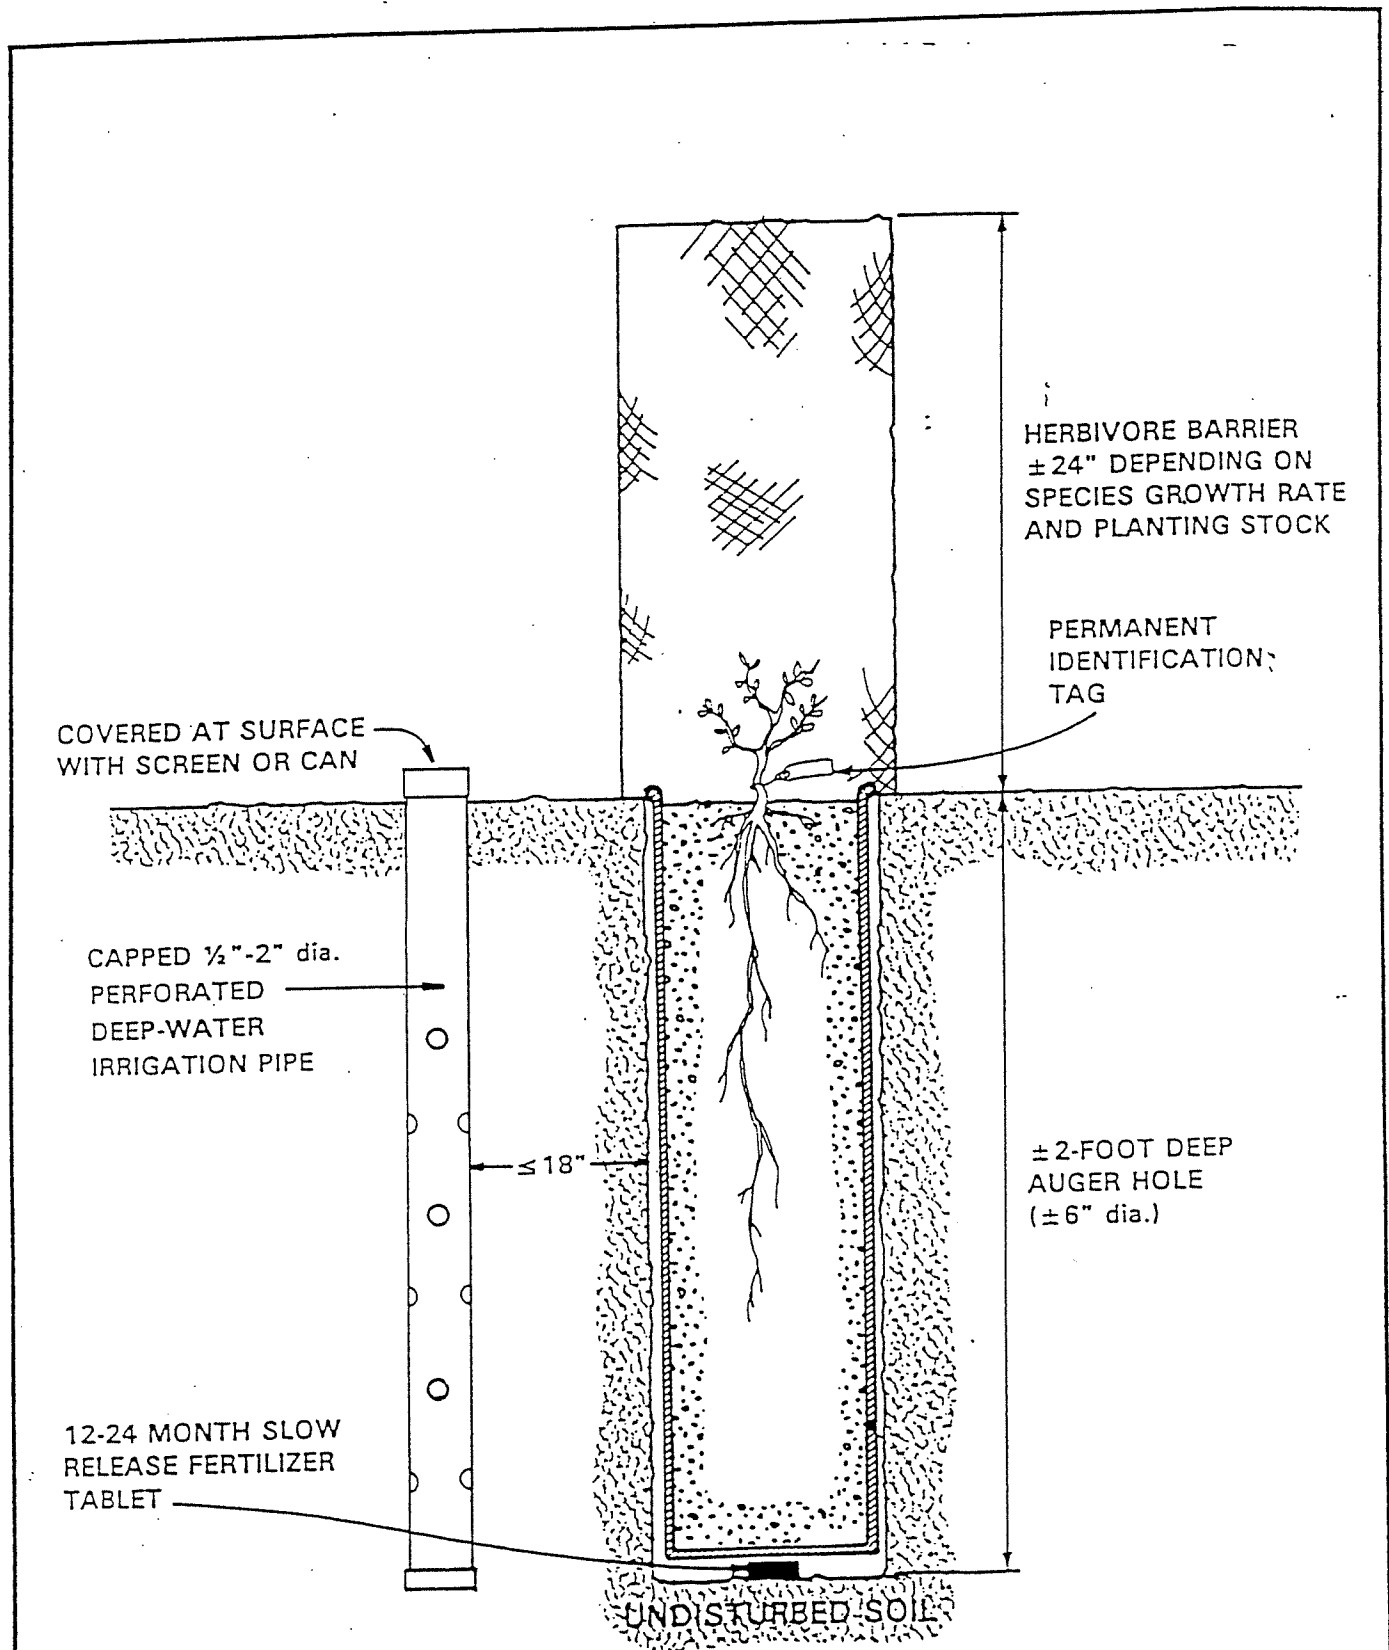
Conceptual sketch of planting procedures and plant protection.
